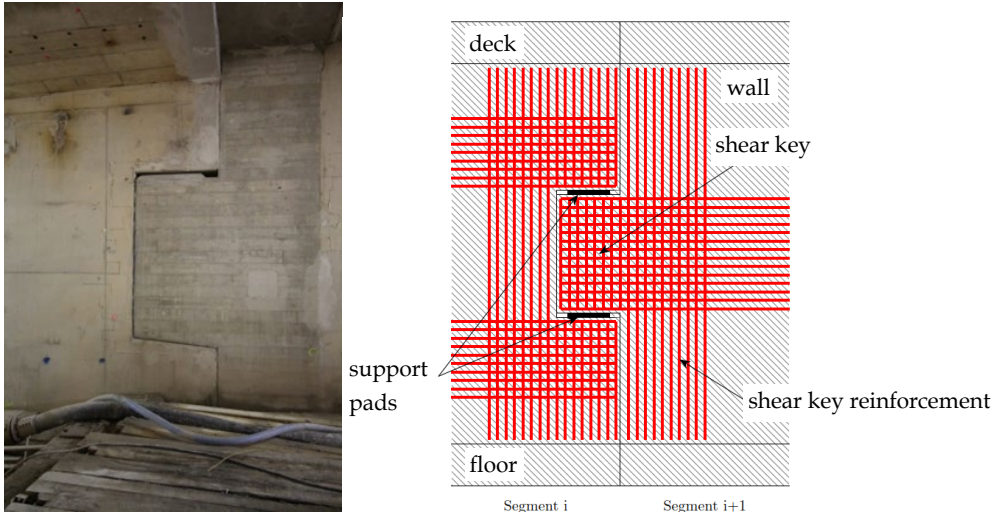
Concrete shear key in the Maasdeltatunnel (left) in an immersed tunnel and typical reinforcement layout (right)
